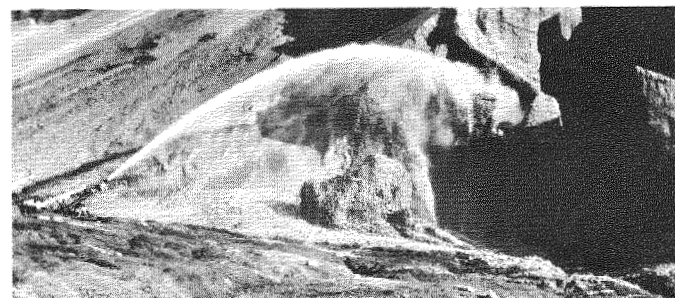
Hydraulic stripping of muck overburden to expose underlying frozen gravel and sand
